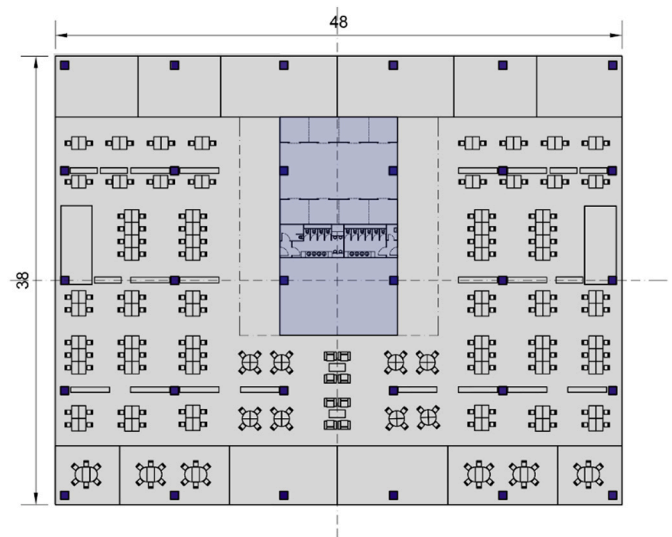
Typical office floor plan (Adapted from BCO Guide to Specification [84]).
